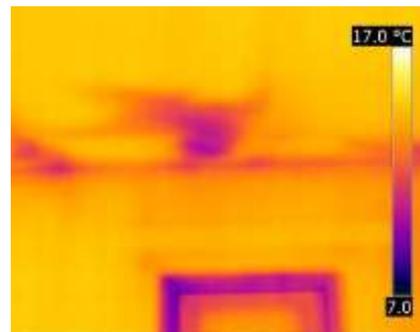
Missing insulation or thermal bridge in ceiling. Plot 23 bathroom first floor
